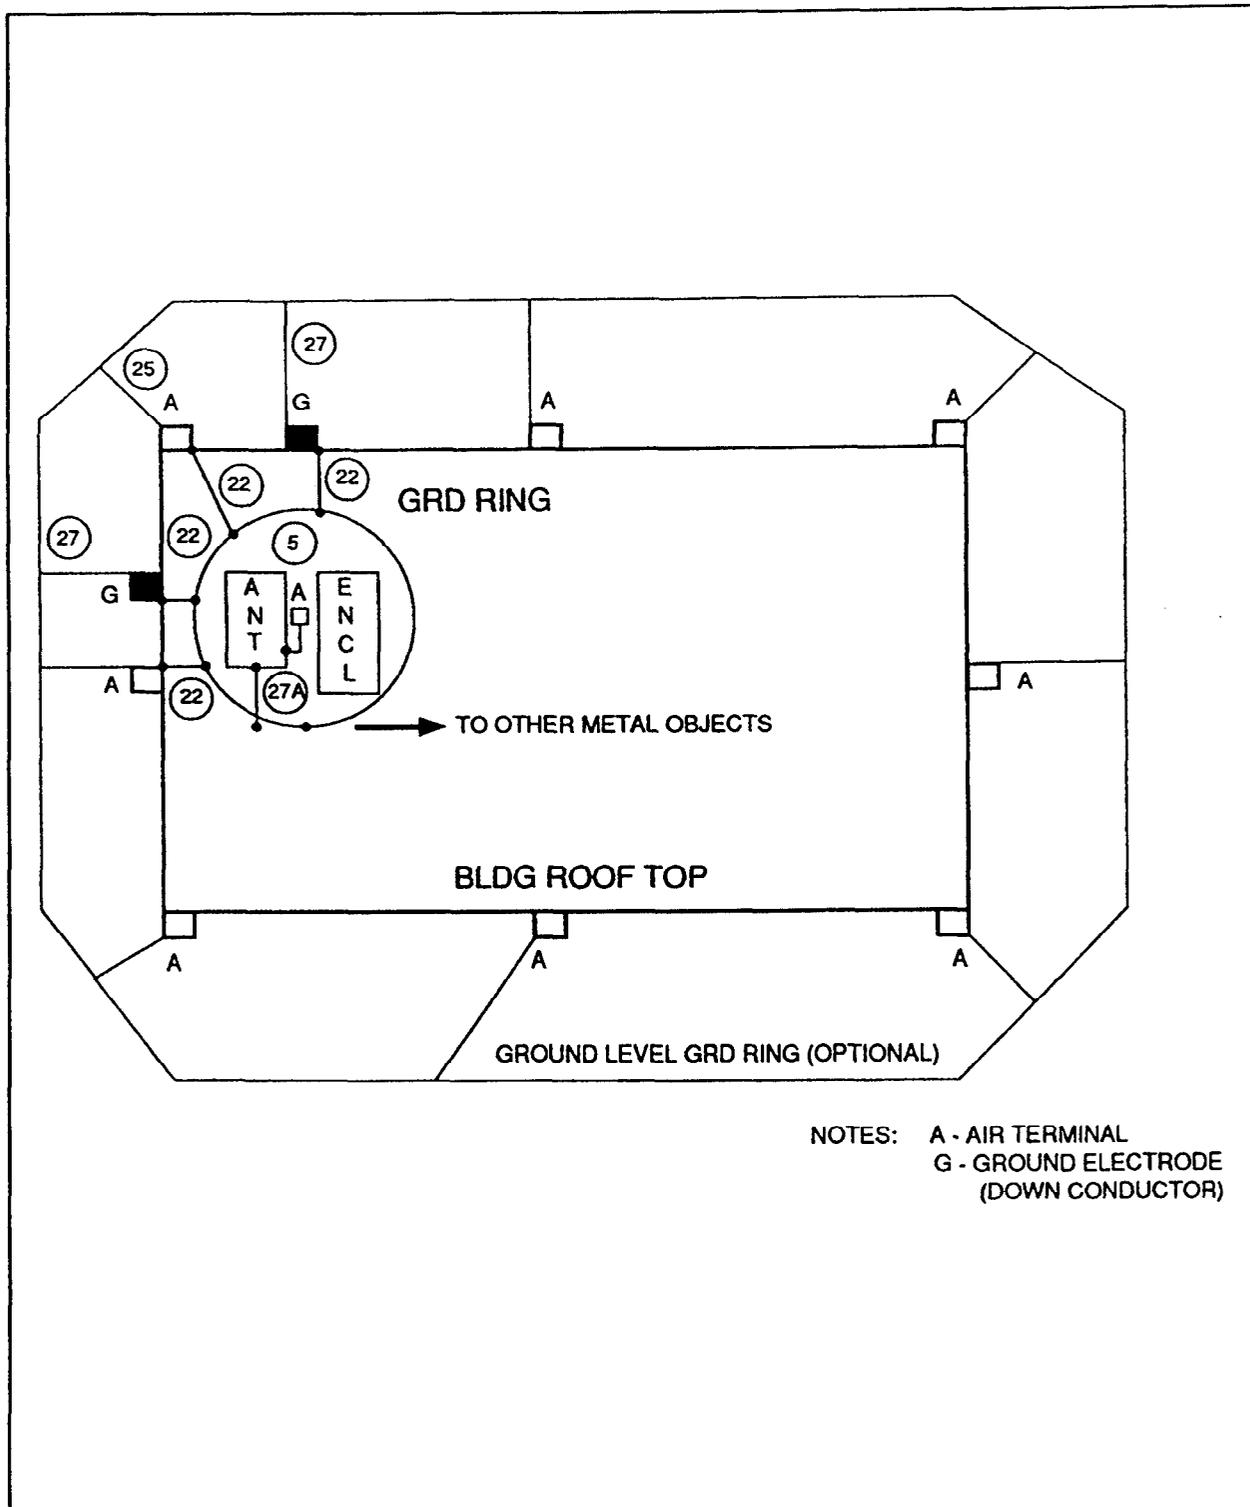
Typical Grounding for a Rooftop Earth Station
